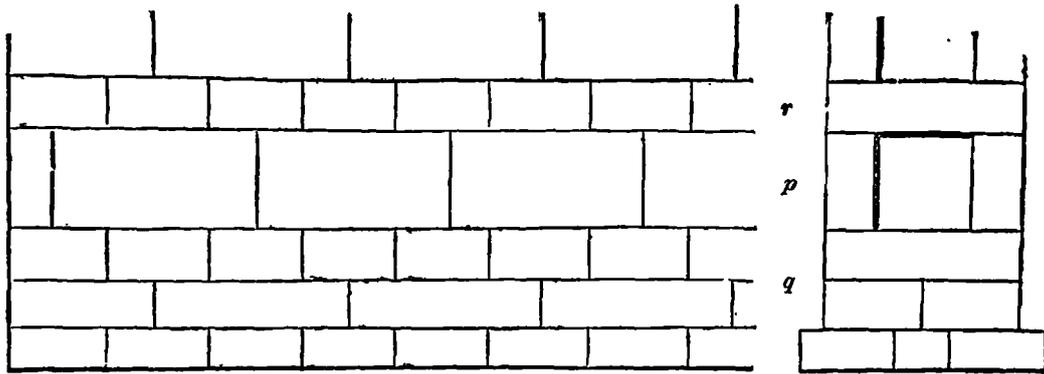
Dearn's method of building hollow walls; elevation and section of part of a wall.
